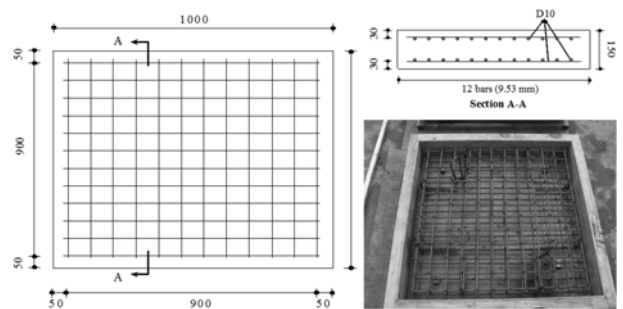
Test specimen geometry and reinforcement details (unit : mm)
